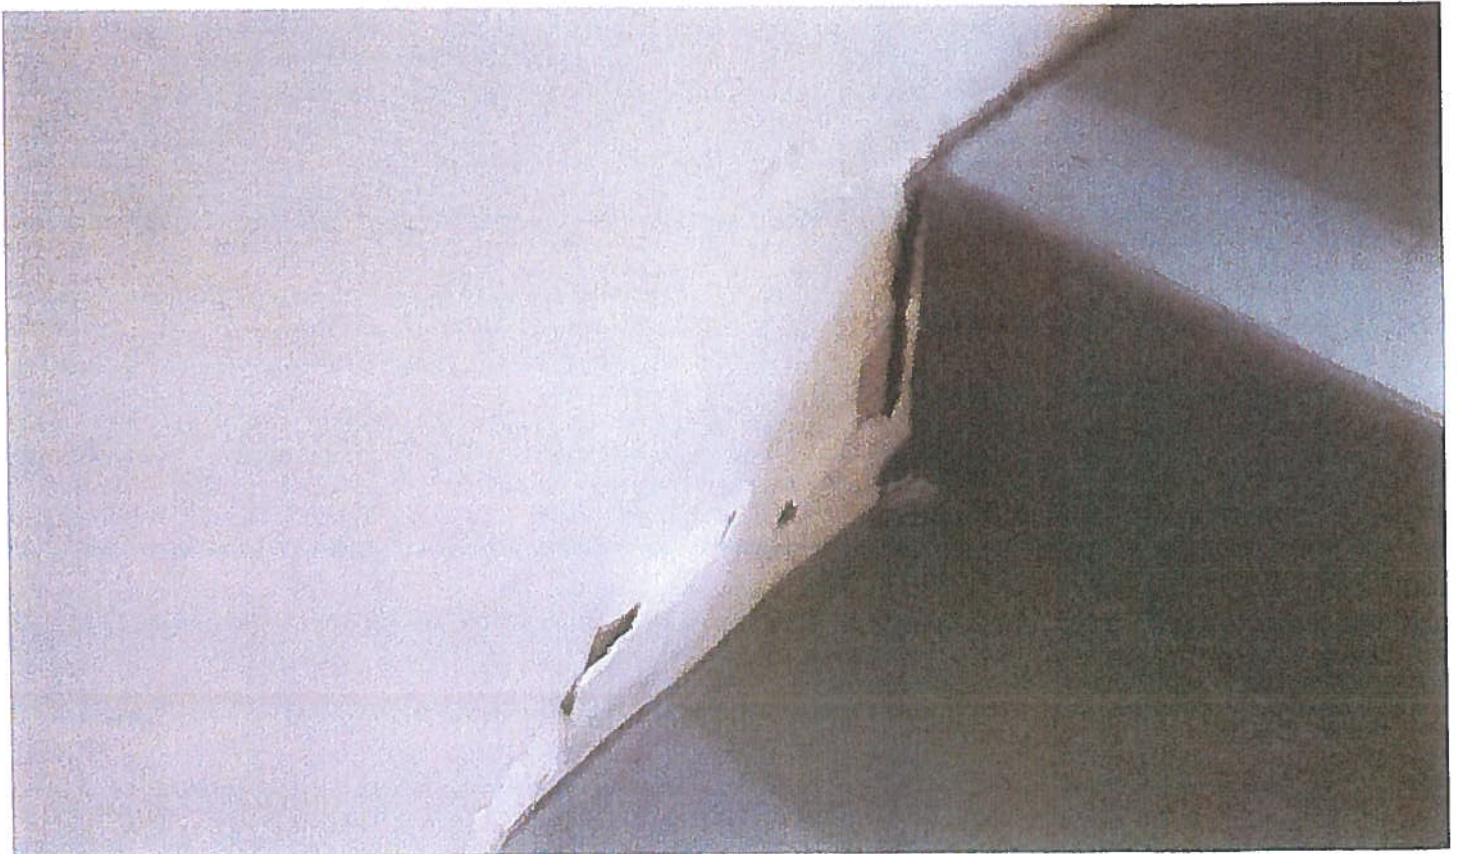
Cracking and slight displacement of the stairs adjacent to the masonry wall.
